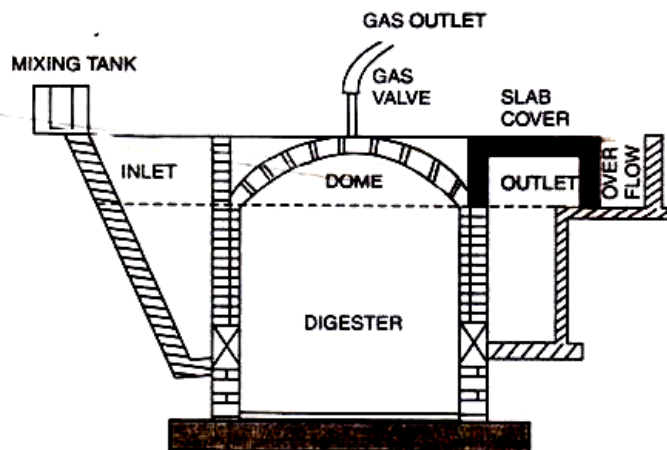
FIXED DOME TYPE BIOGAS PLANT
